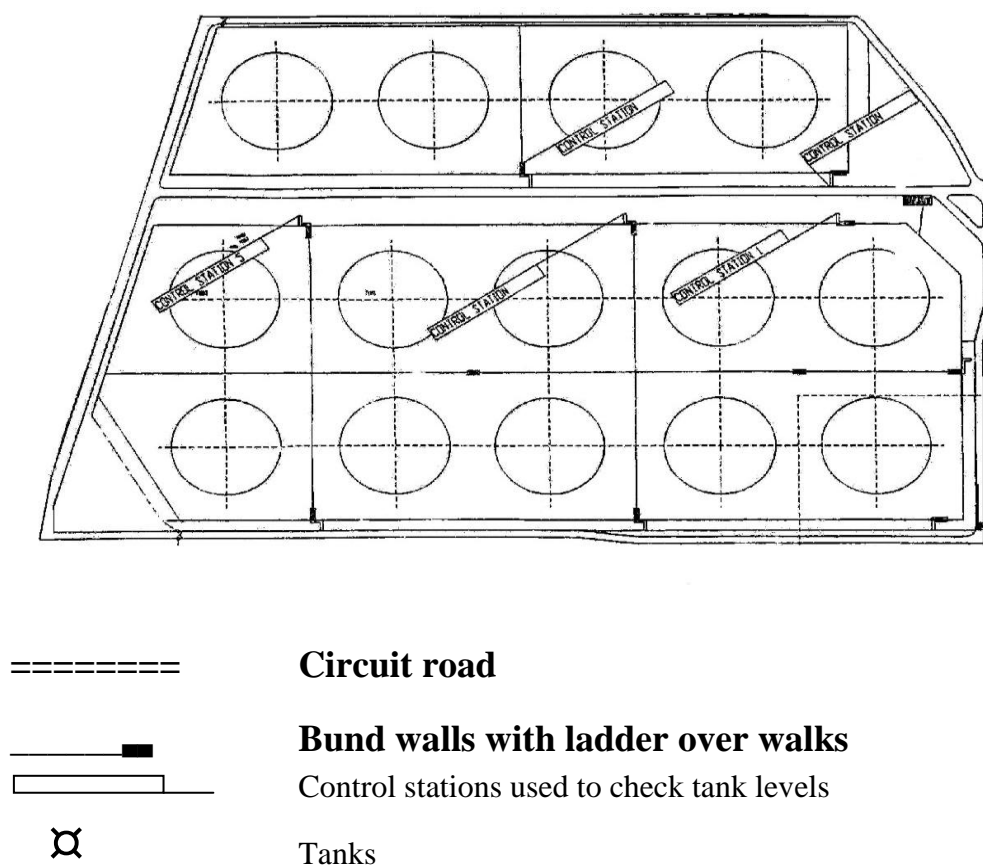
A typical tank farm showing tanks surrounded by bund walls
